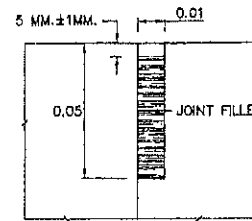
DETAIL OF JOINT BETWEEN CONCRETE PAVEMENT AND FLEXIBLE PAVEMENT
